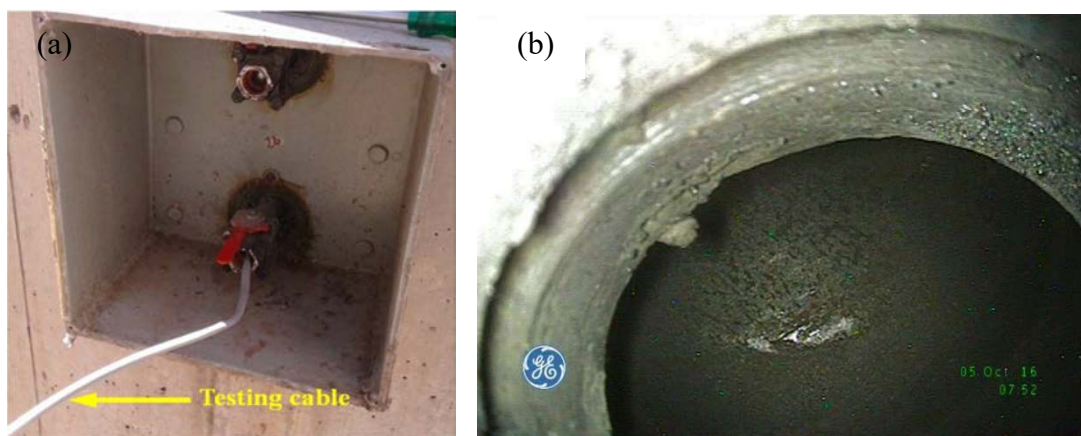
(a): Introducing a test cable into the silo. (b): View of the canister surface (courtesy of CNEA).
